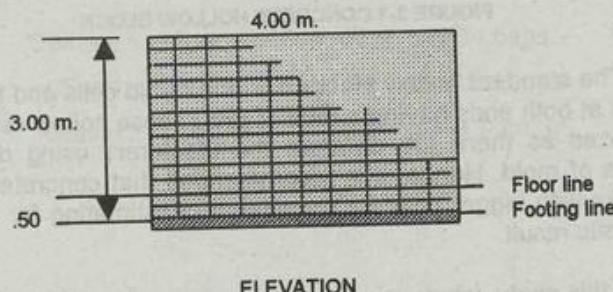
CONCRETE HOLLOW BLOCKS WALL
